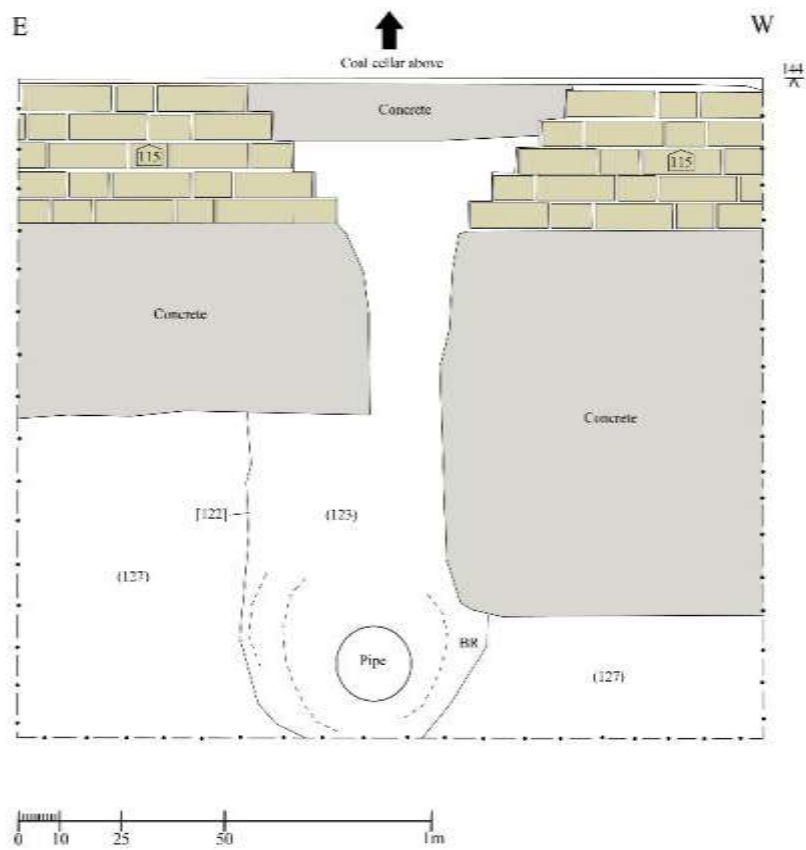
Dropshaft 15, north facing section. Original drawn at 1:10.
